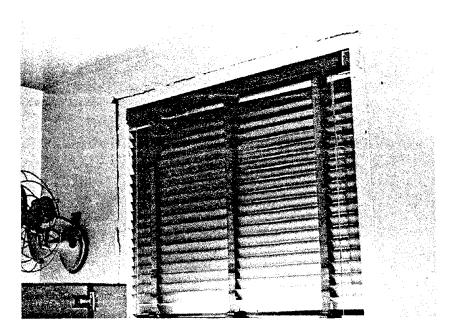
WINDOW JAMB IN SIXTH FLOOR JOLTED OUT OF PLACE BY STRONG SHAKING OF BUILDING 3
